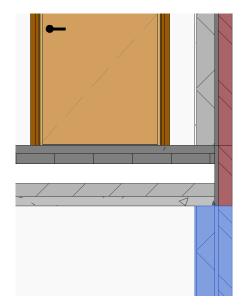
External wall with the right height to avoid overlapping with the floor.
